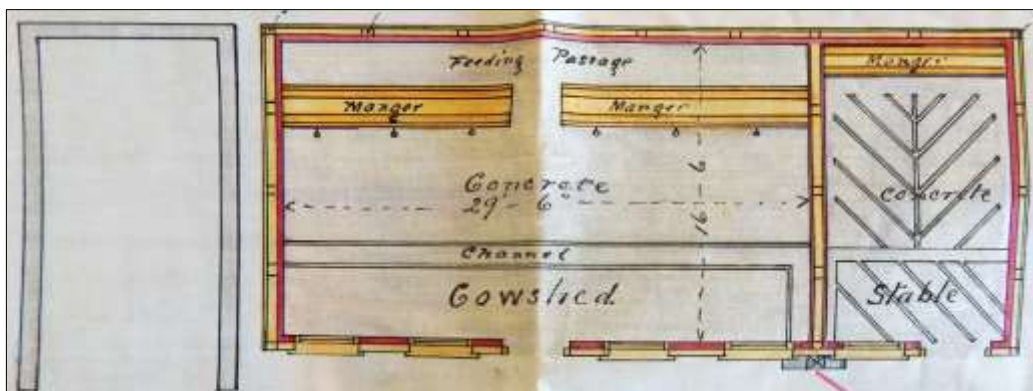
Plan of development from 1912 drawings (scale 1:100)
